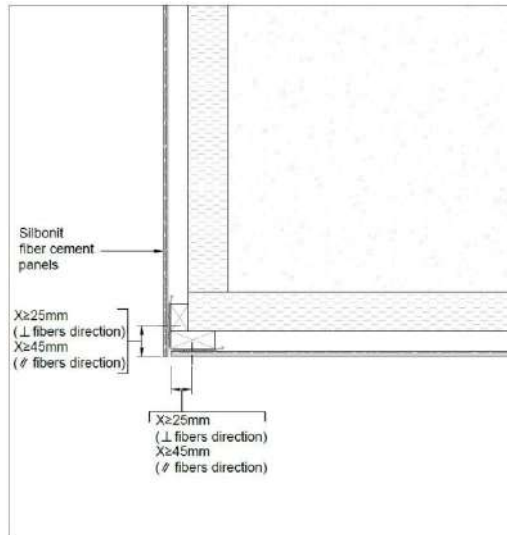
Example of a horizontal section of the ventilated facade package along an external corner with an open vertical joint between the cladding panels. Wooden subframe.
